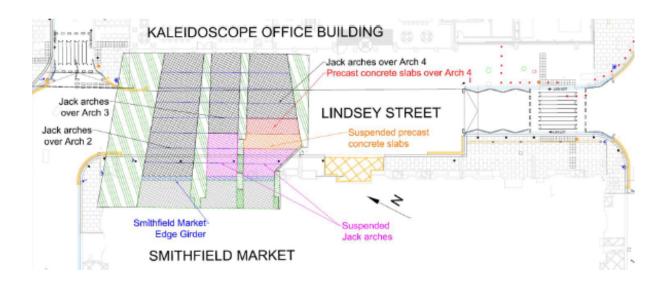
Schemtic plan view of Lindsey Srtreet Bridge (Structural arrangment under western footway is inferred from limited available information).
